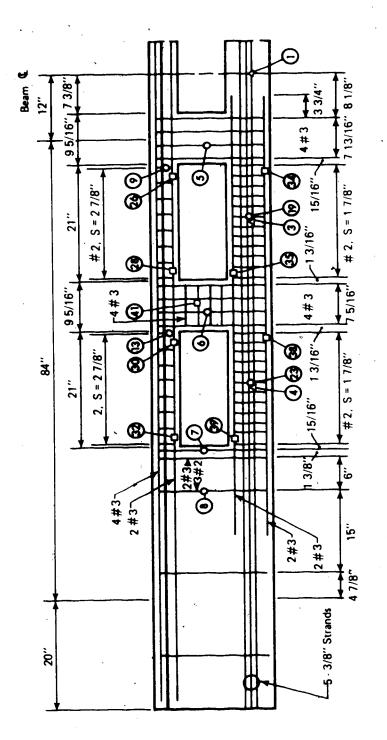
Reinforcement Details and Strain Gage Locations for Beam 26-21-7
